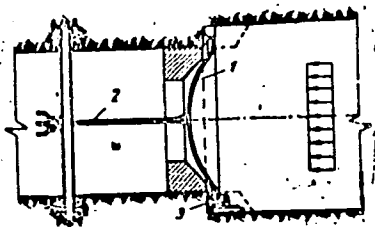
1 - shell; 2 - tension mechanism; 3 - strengthening insert
